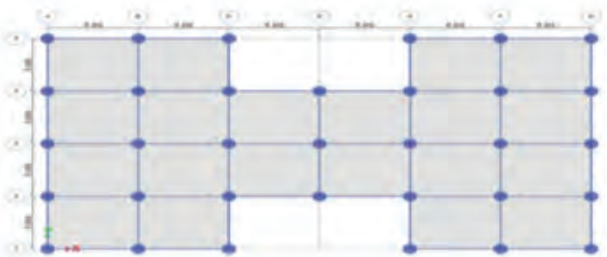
Structural Plan of G+15 H-Shaped Building with Circular columns
